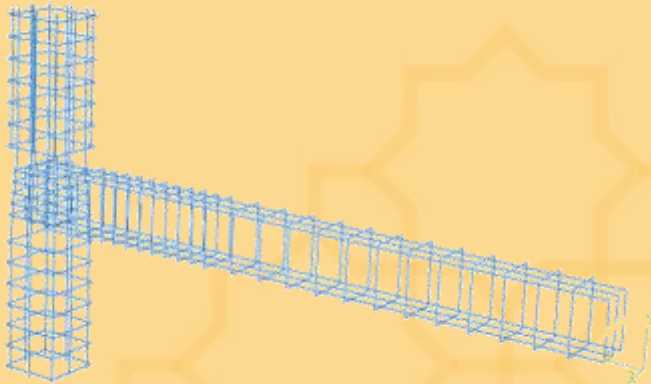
Detail of Cantilever beam sample 1 (BK-1)
